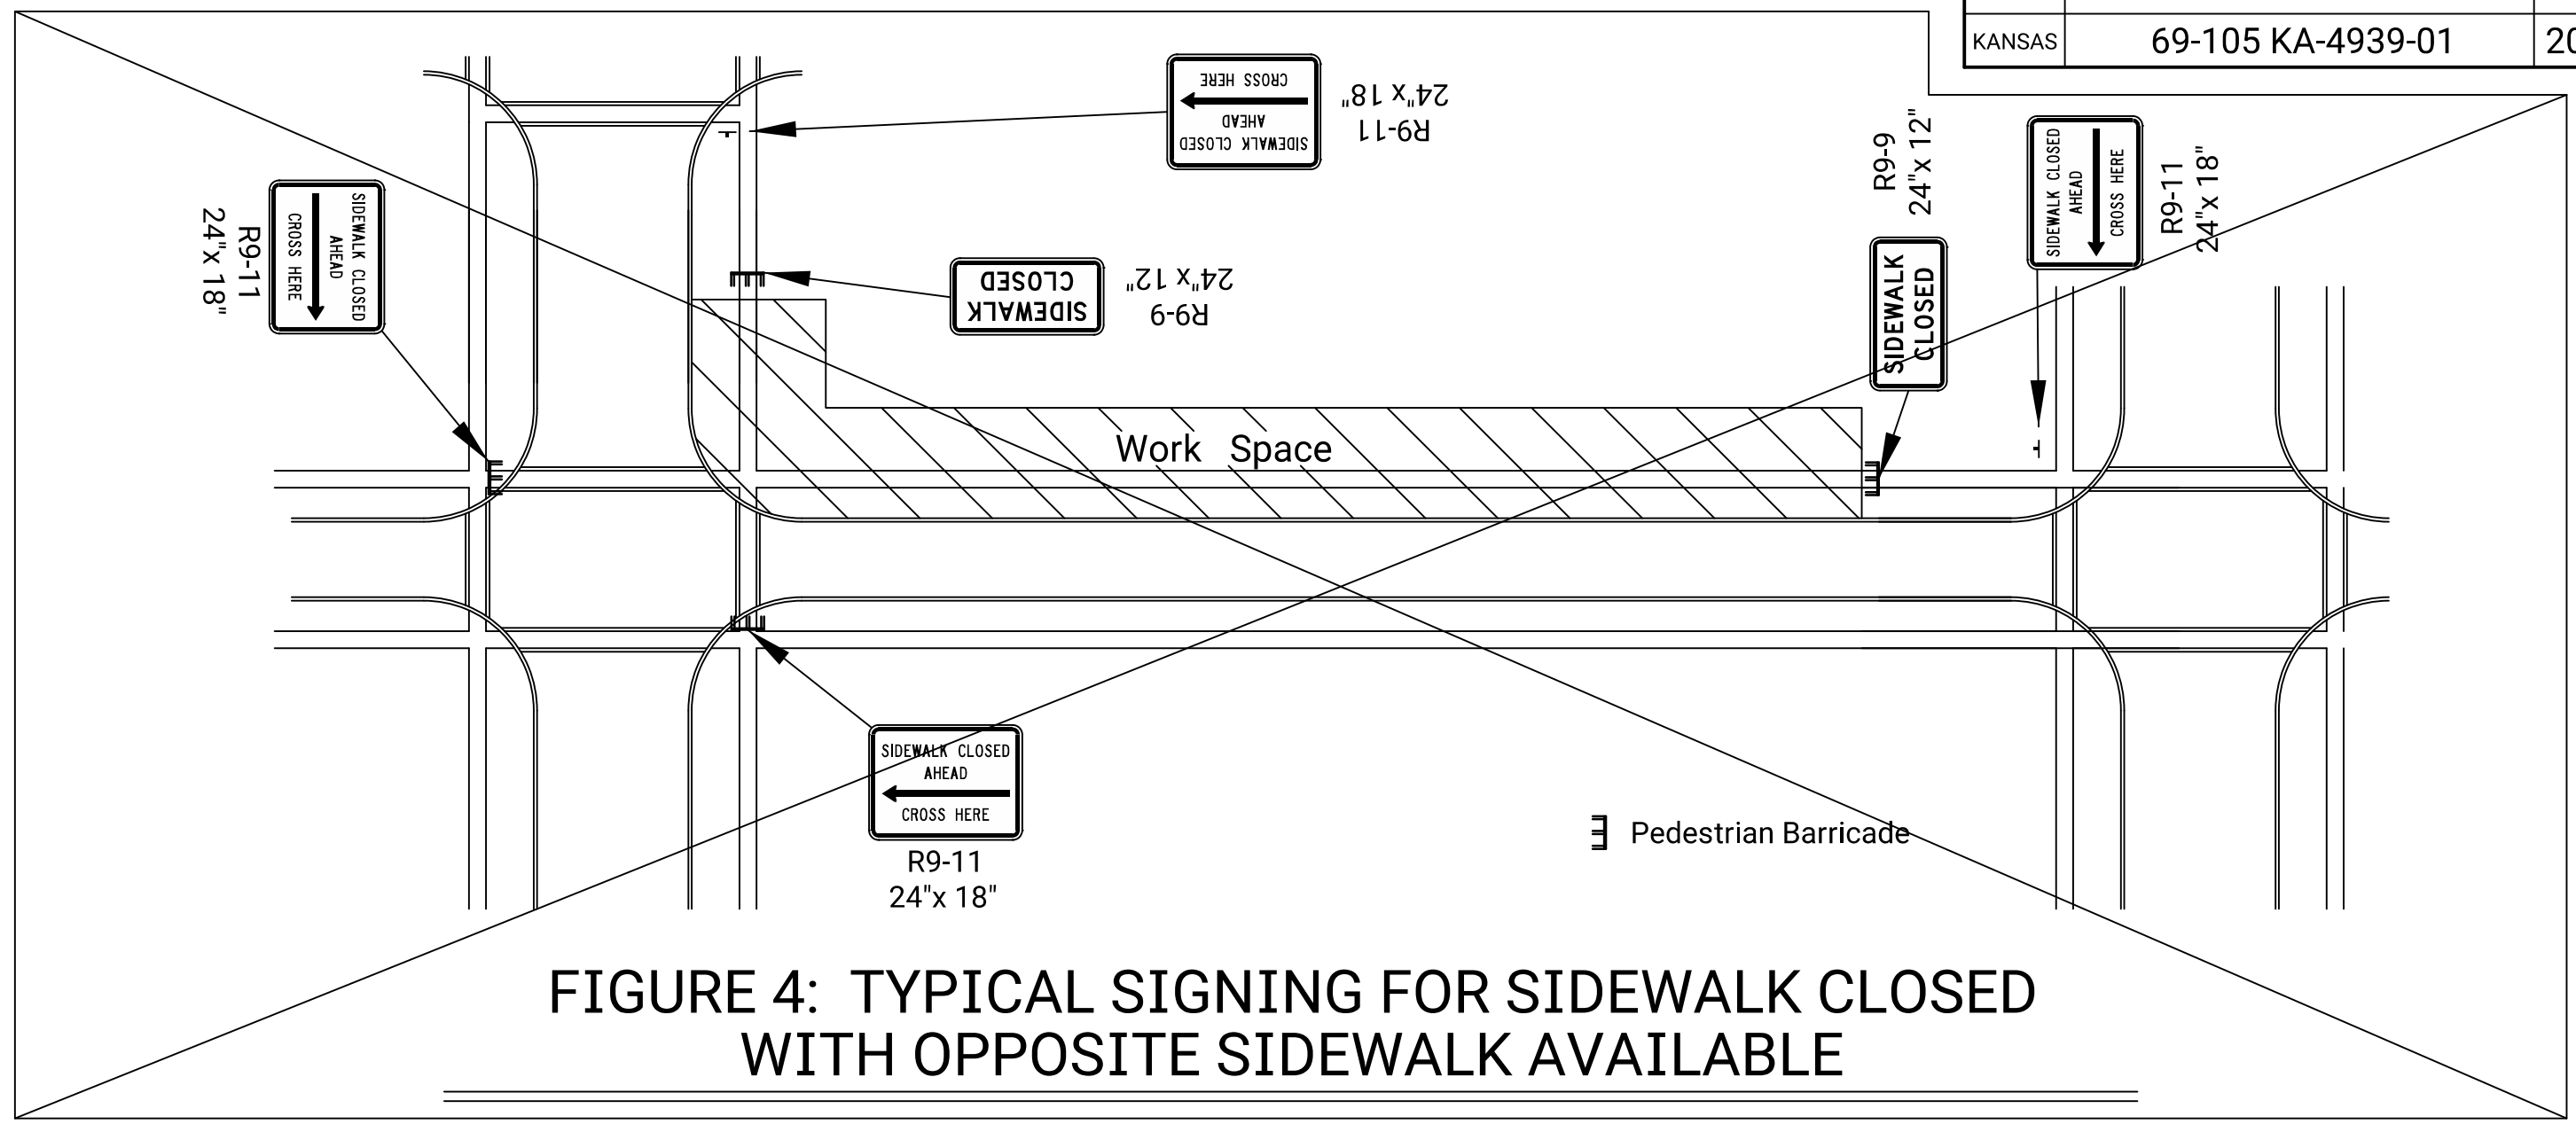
TYPICAL SIGNING FOR SIDEWALK CLOSED WITH OPPOSITE SIDEWALK AVAILABLE
